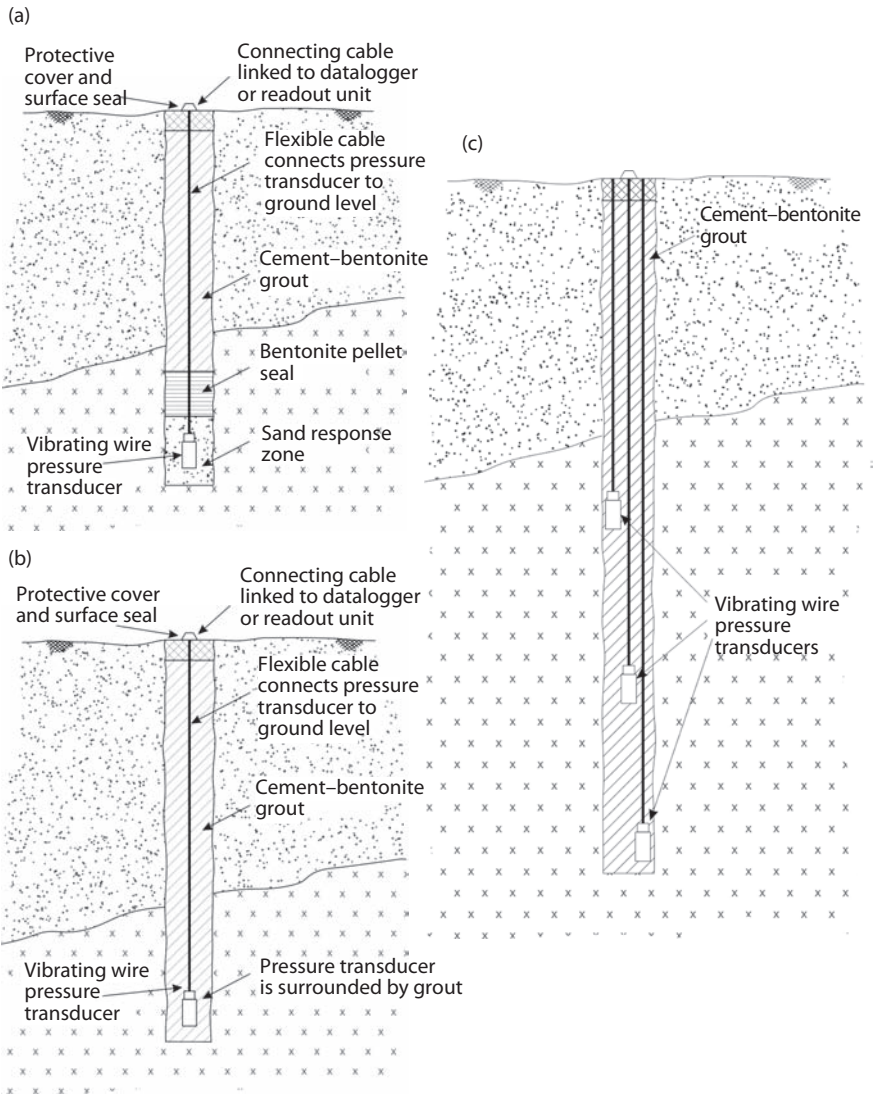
Installation of VVPs. (a) Installation in sand response zone. (b) Installation in fully grouted borehole. (c) Installation of multiple piezometers in fully grouted borehole.
